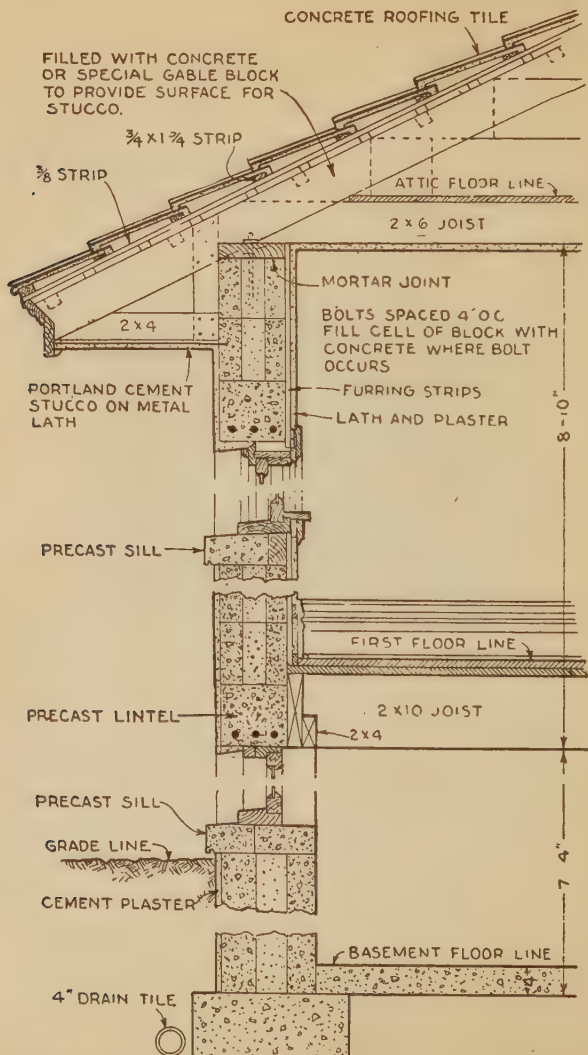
,204.—Sectional view of concrete block wall construction showing details.
